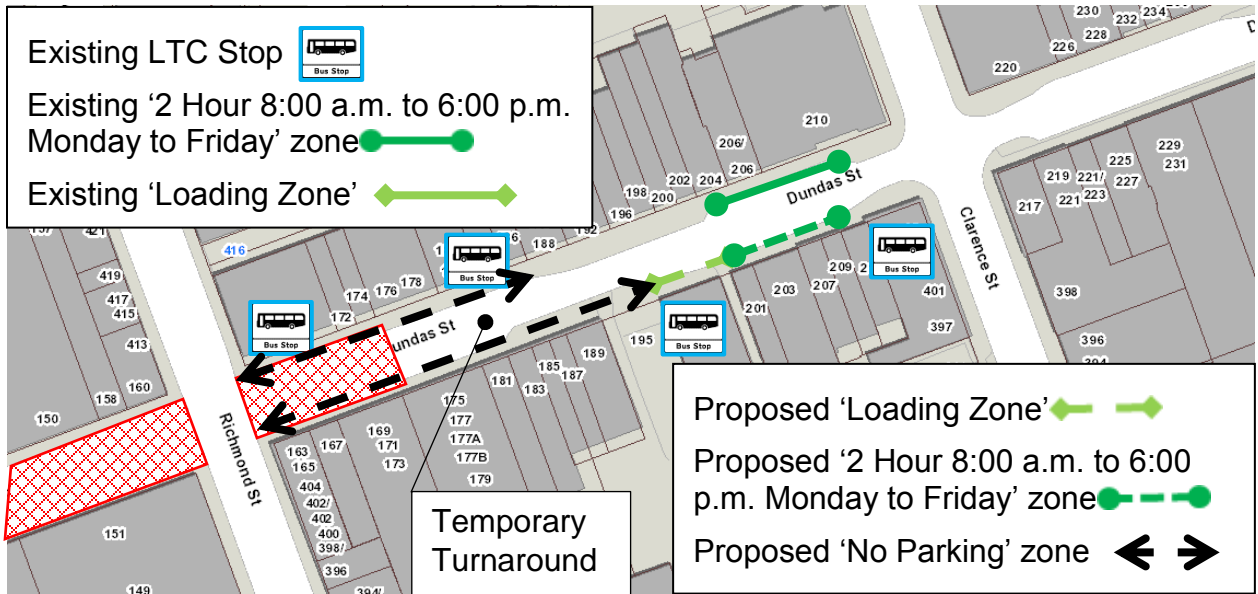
Dundas Street –Richmond Street to Clarence Street Existing and Proposed Interim Changes
